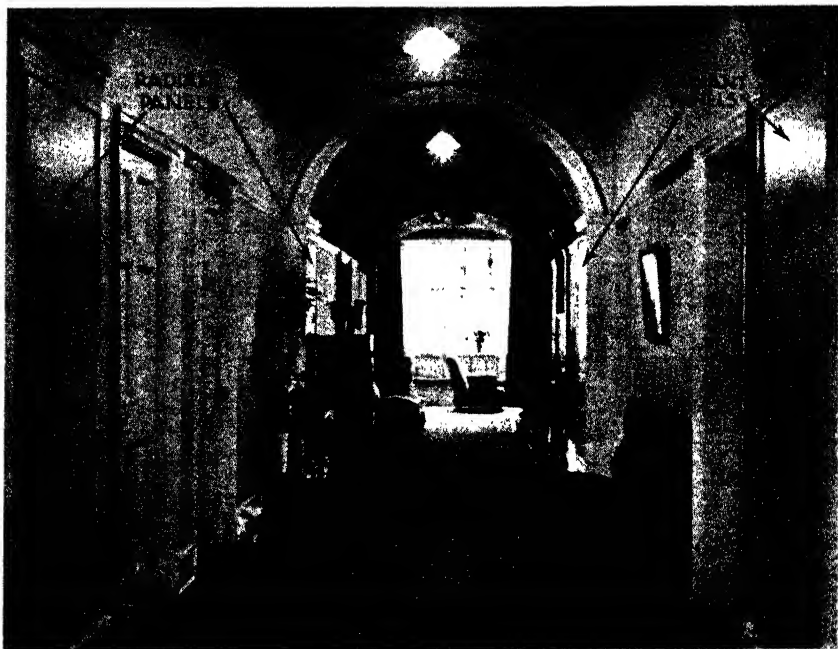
CORRIDOR WARMED BY WALL PANELS OF THE SUPERIMPOSED TYPE
